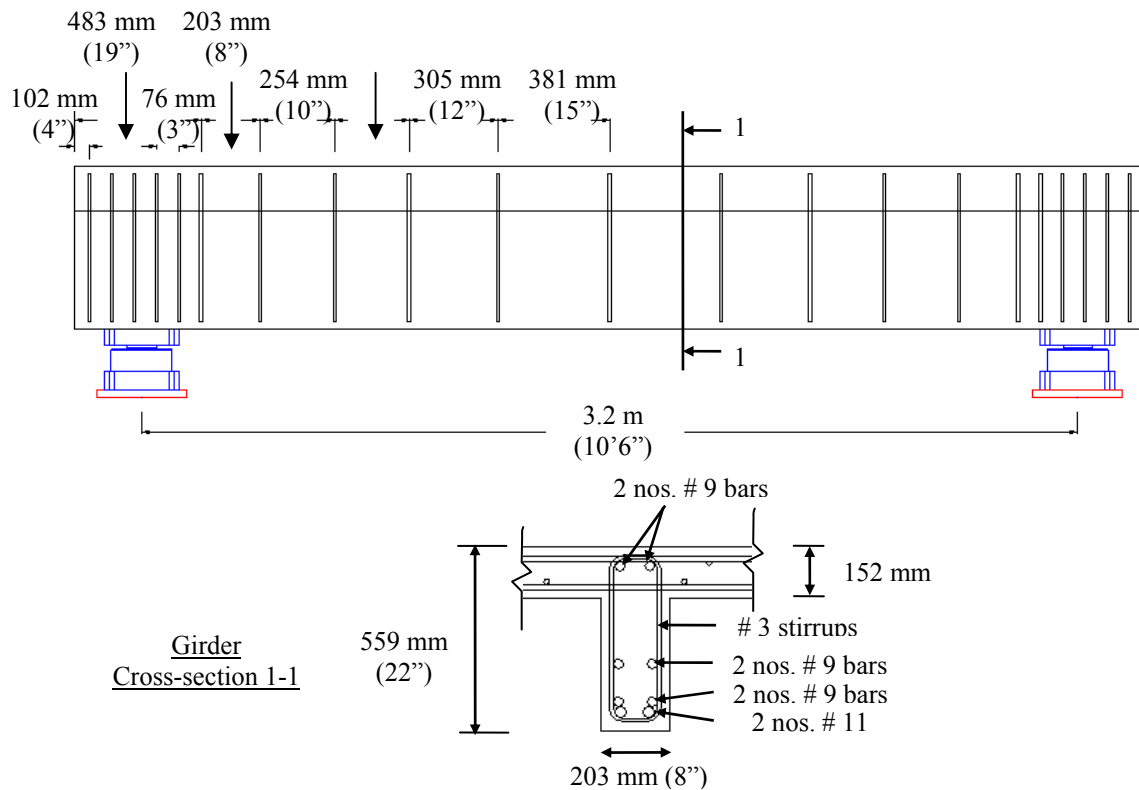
Internal steel stirrup details in middle longitudinal girder
